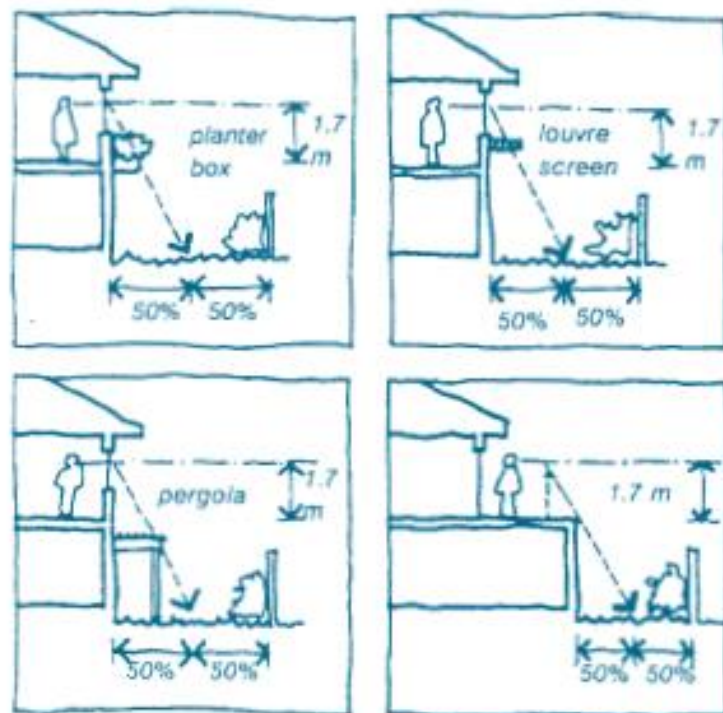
Techniques for providing privacy to a lower dwelling's private open space.
